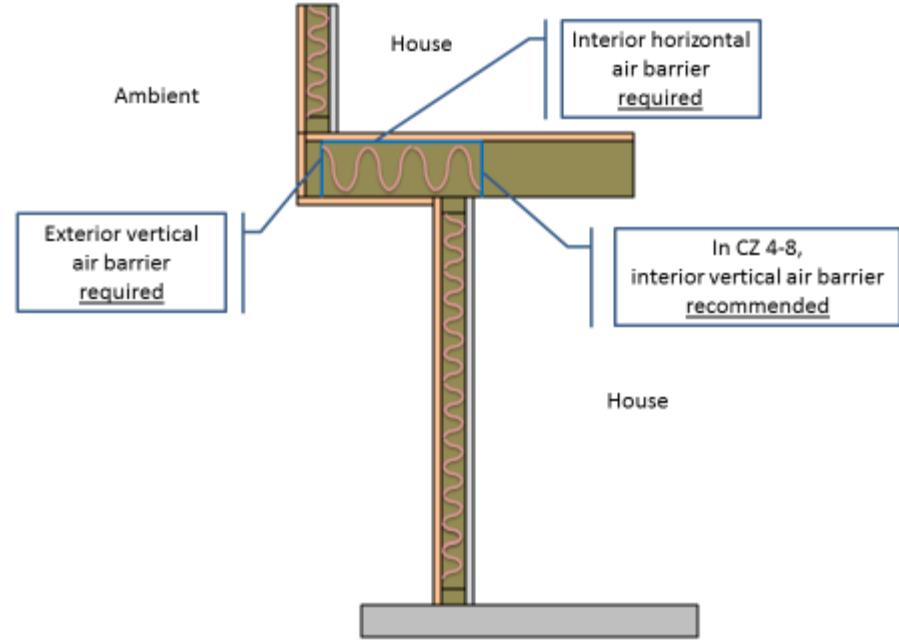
Floor Cavity Adjacent to & Over Outdoors
